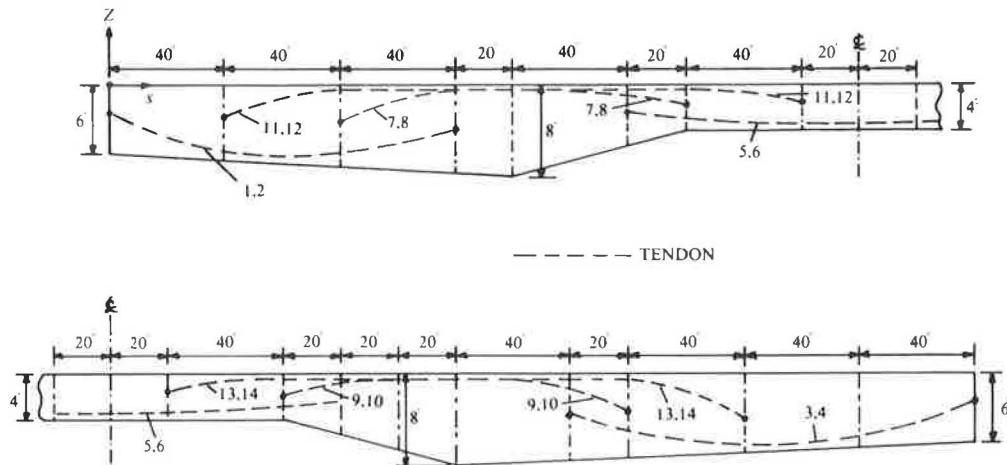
Example 1: three-span curved nonprismatic prestressed concrete bridge—longitudinal section along centerline.
